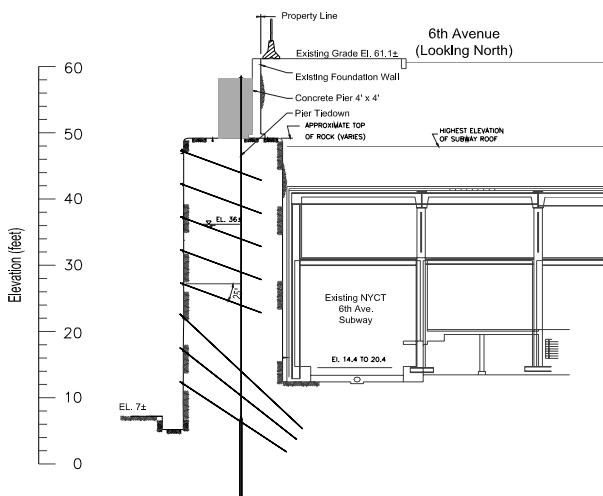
BOA Section at 6th Avenue along NYCT Cut & Cover Tunnel
